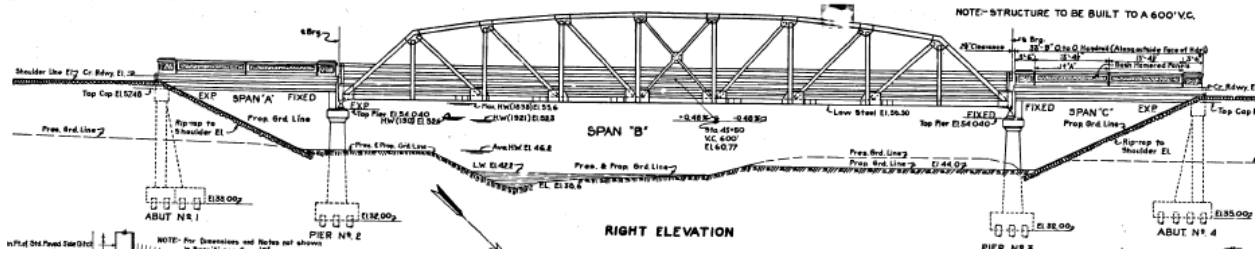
Elevation View of the Bridge (NBI 32200) (1940)
